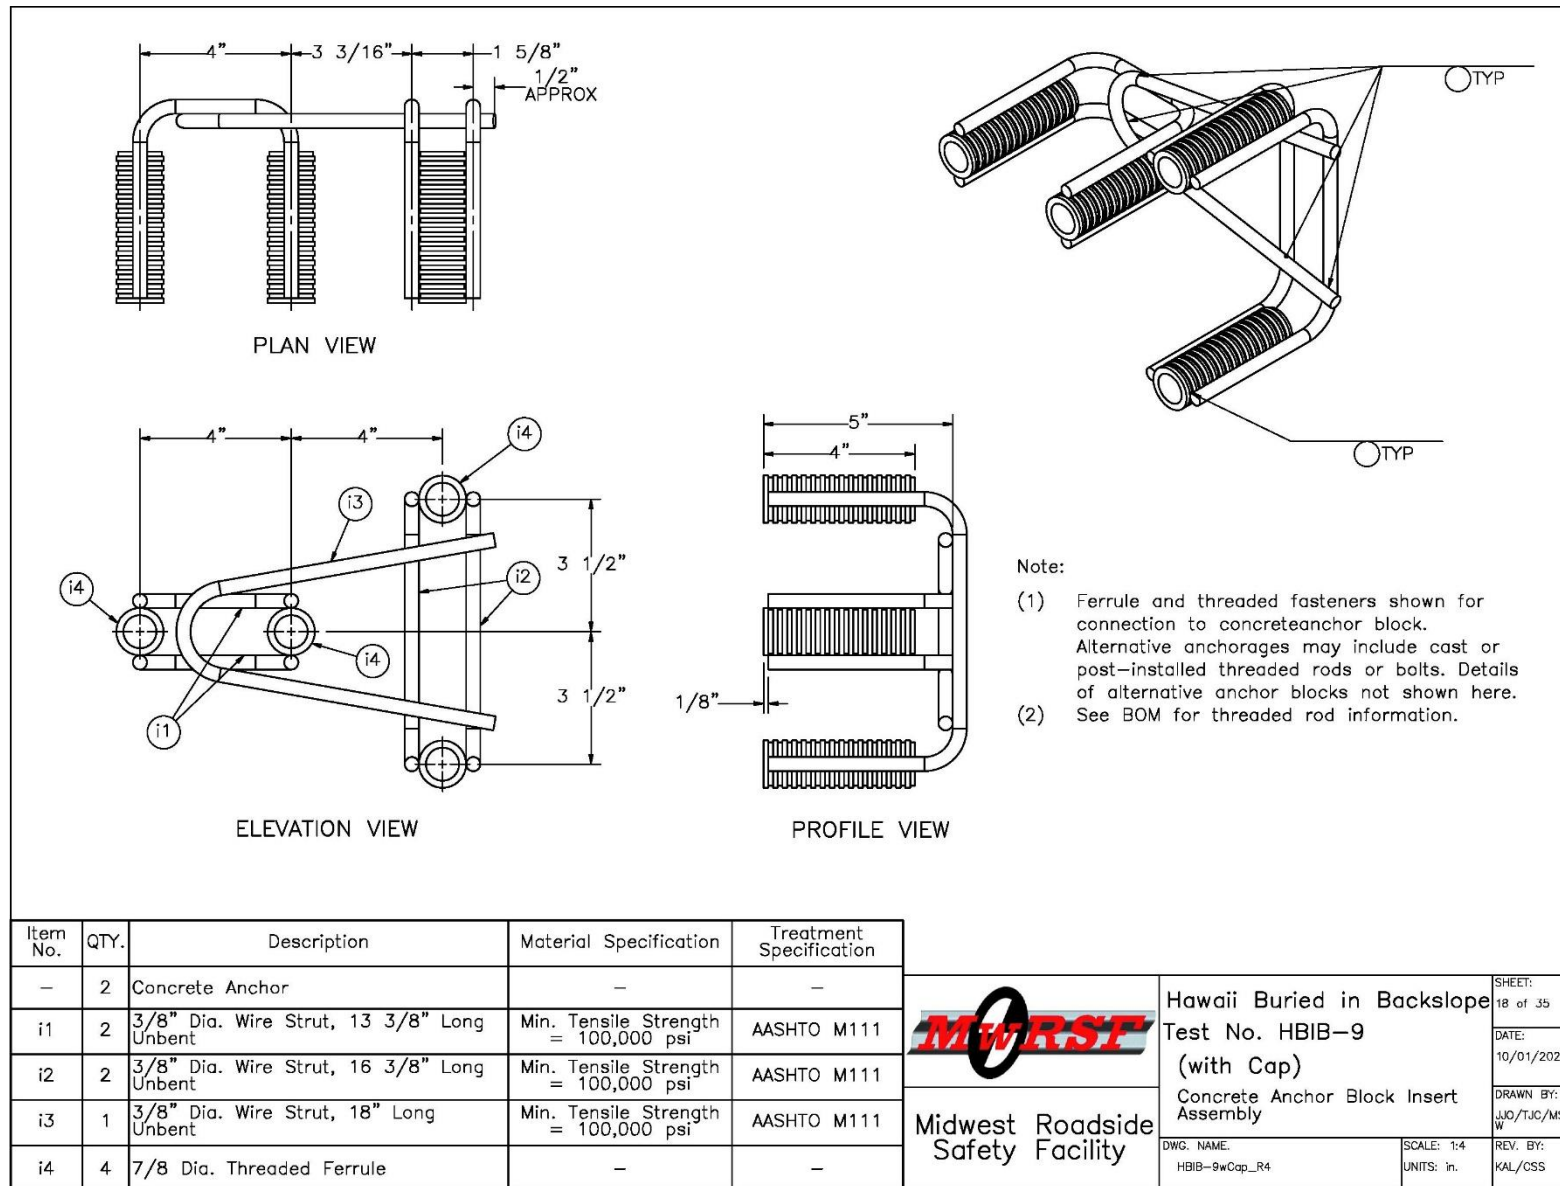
Concrete Anchor Block Insert Assembly, Test No. HBIB-9
